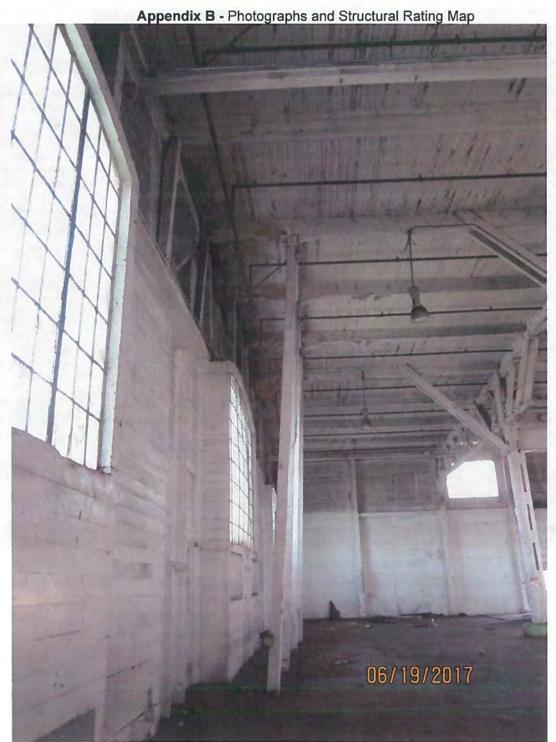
Shoring posts under roof beams near rear wall. Posts are keyed into substructure concrete slab.
